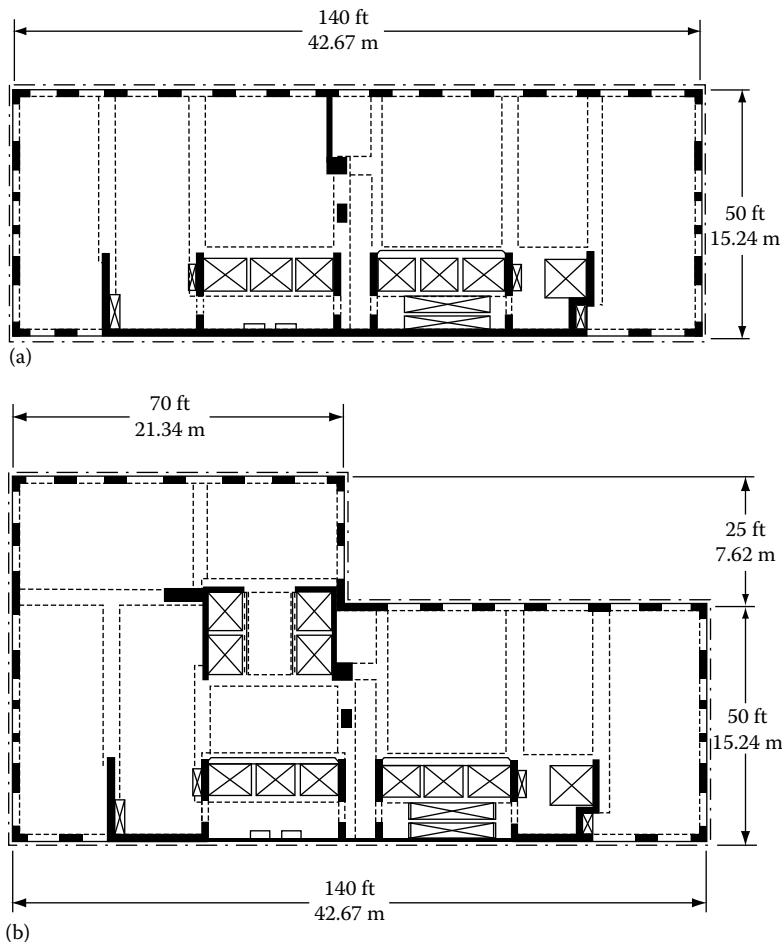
Metropolitan Tower, New York City. (a,b) Framing plans.
